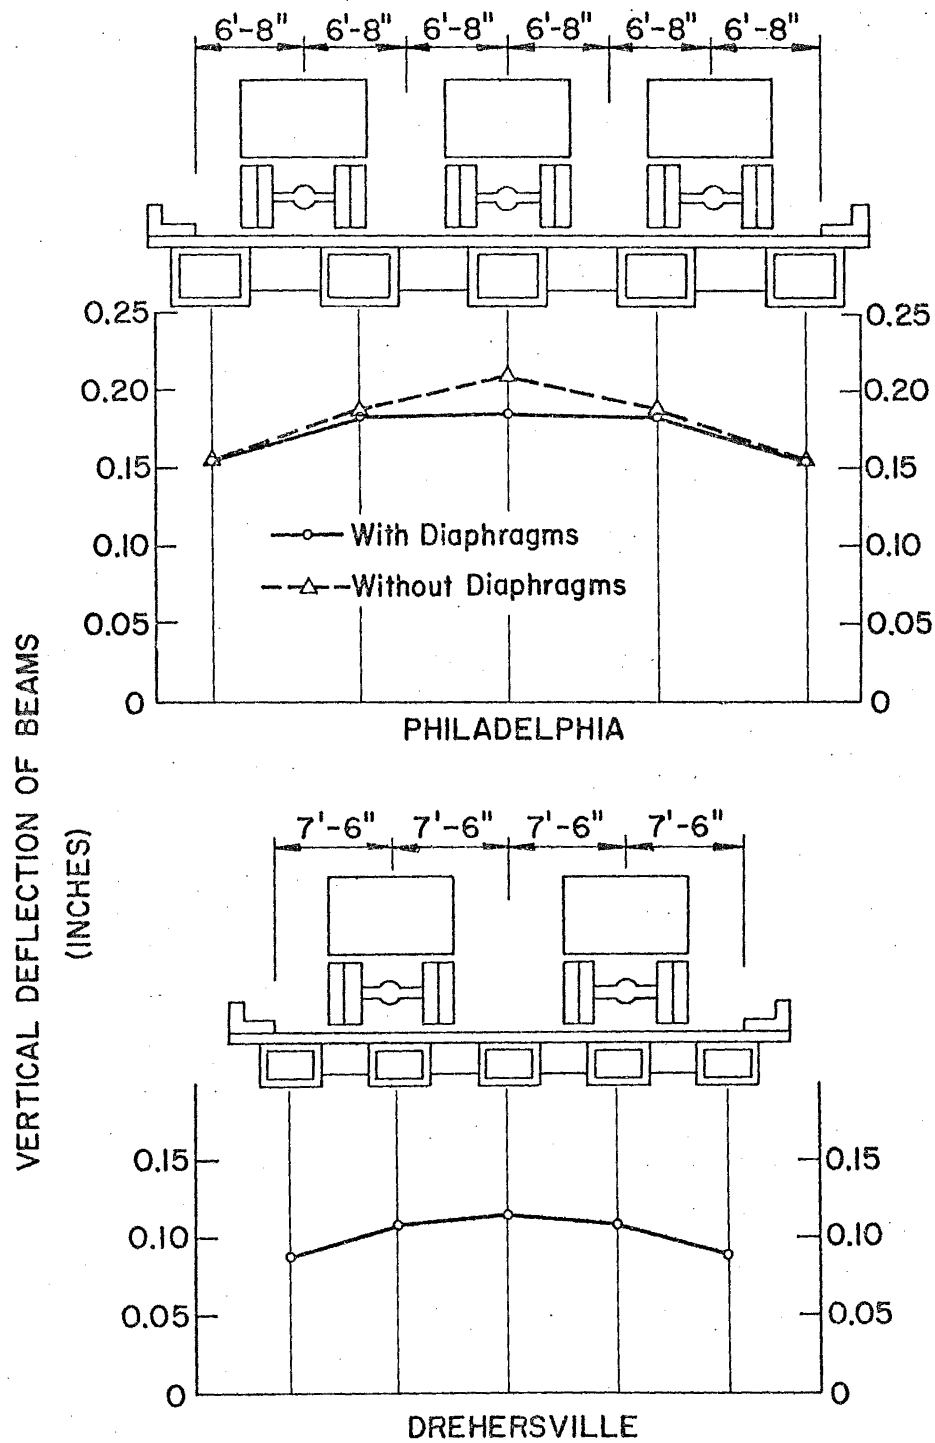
Beam Deflection Profiles (All lanes loaded)
